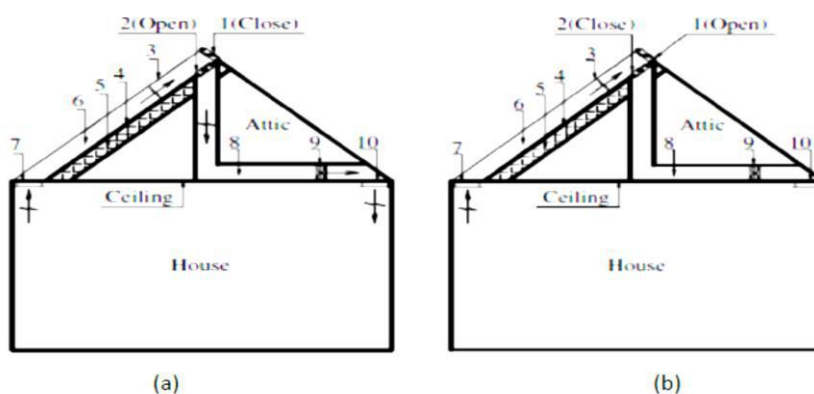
(i): Configuration of SPRSC (a) Room Space heating mode. (b) Natural ventilation enhancement mode. where 1—damper, 2—damper, 3—glass cover, 4—absorber plate, 5—insulation plate, 6—air channel, 7—tuyere, 8—air duct, 9—fan, 10—tuyere.[25]
